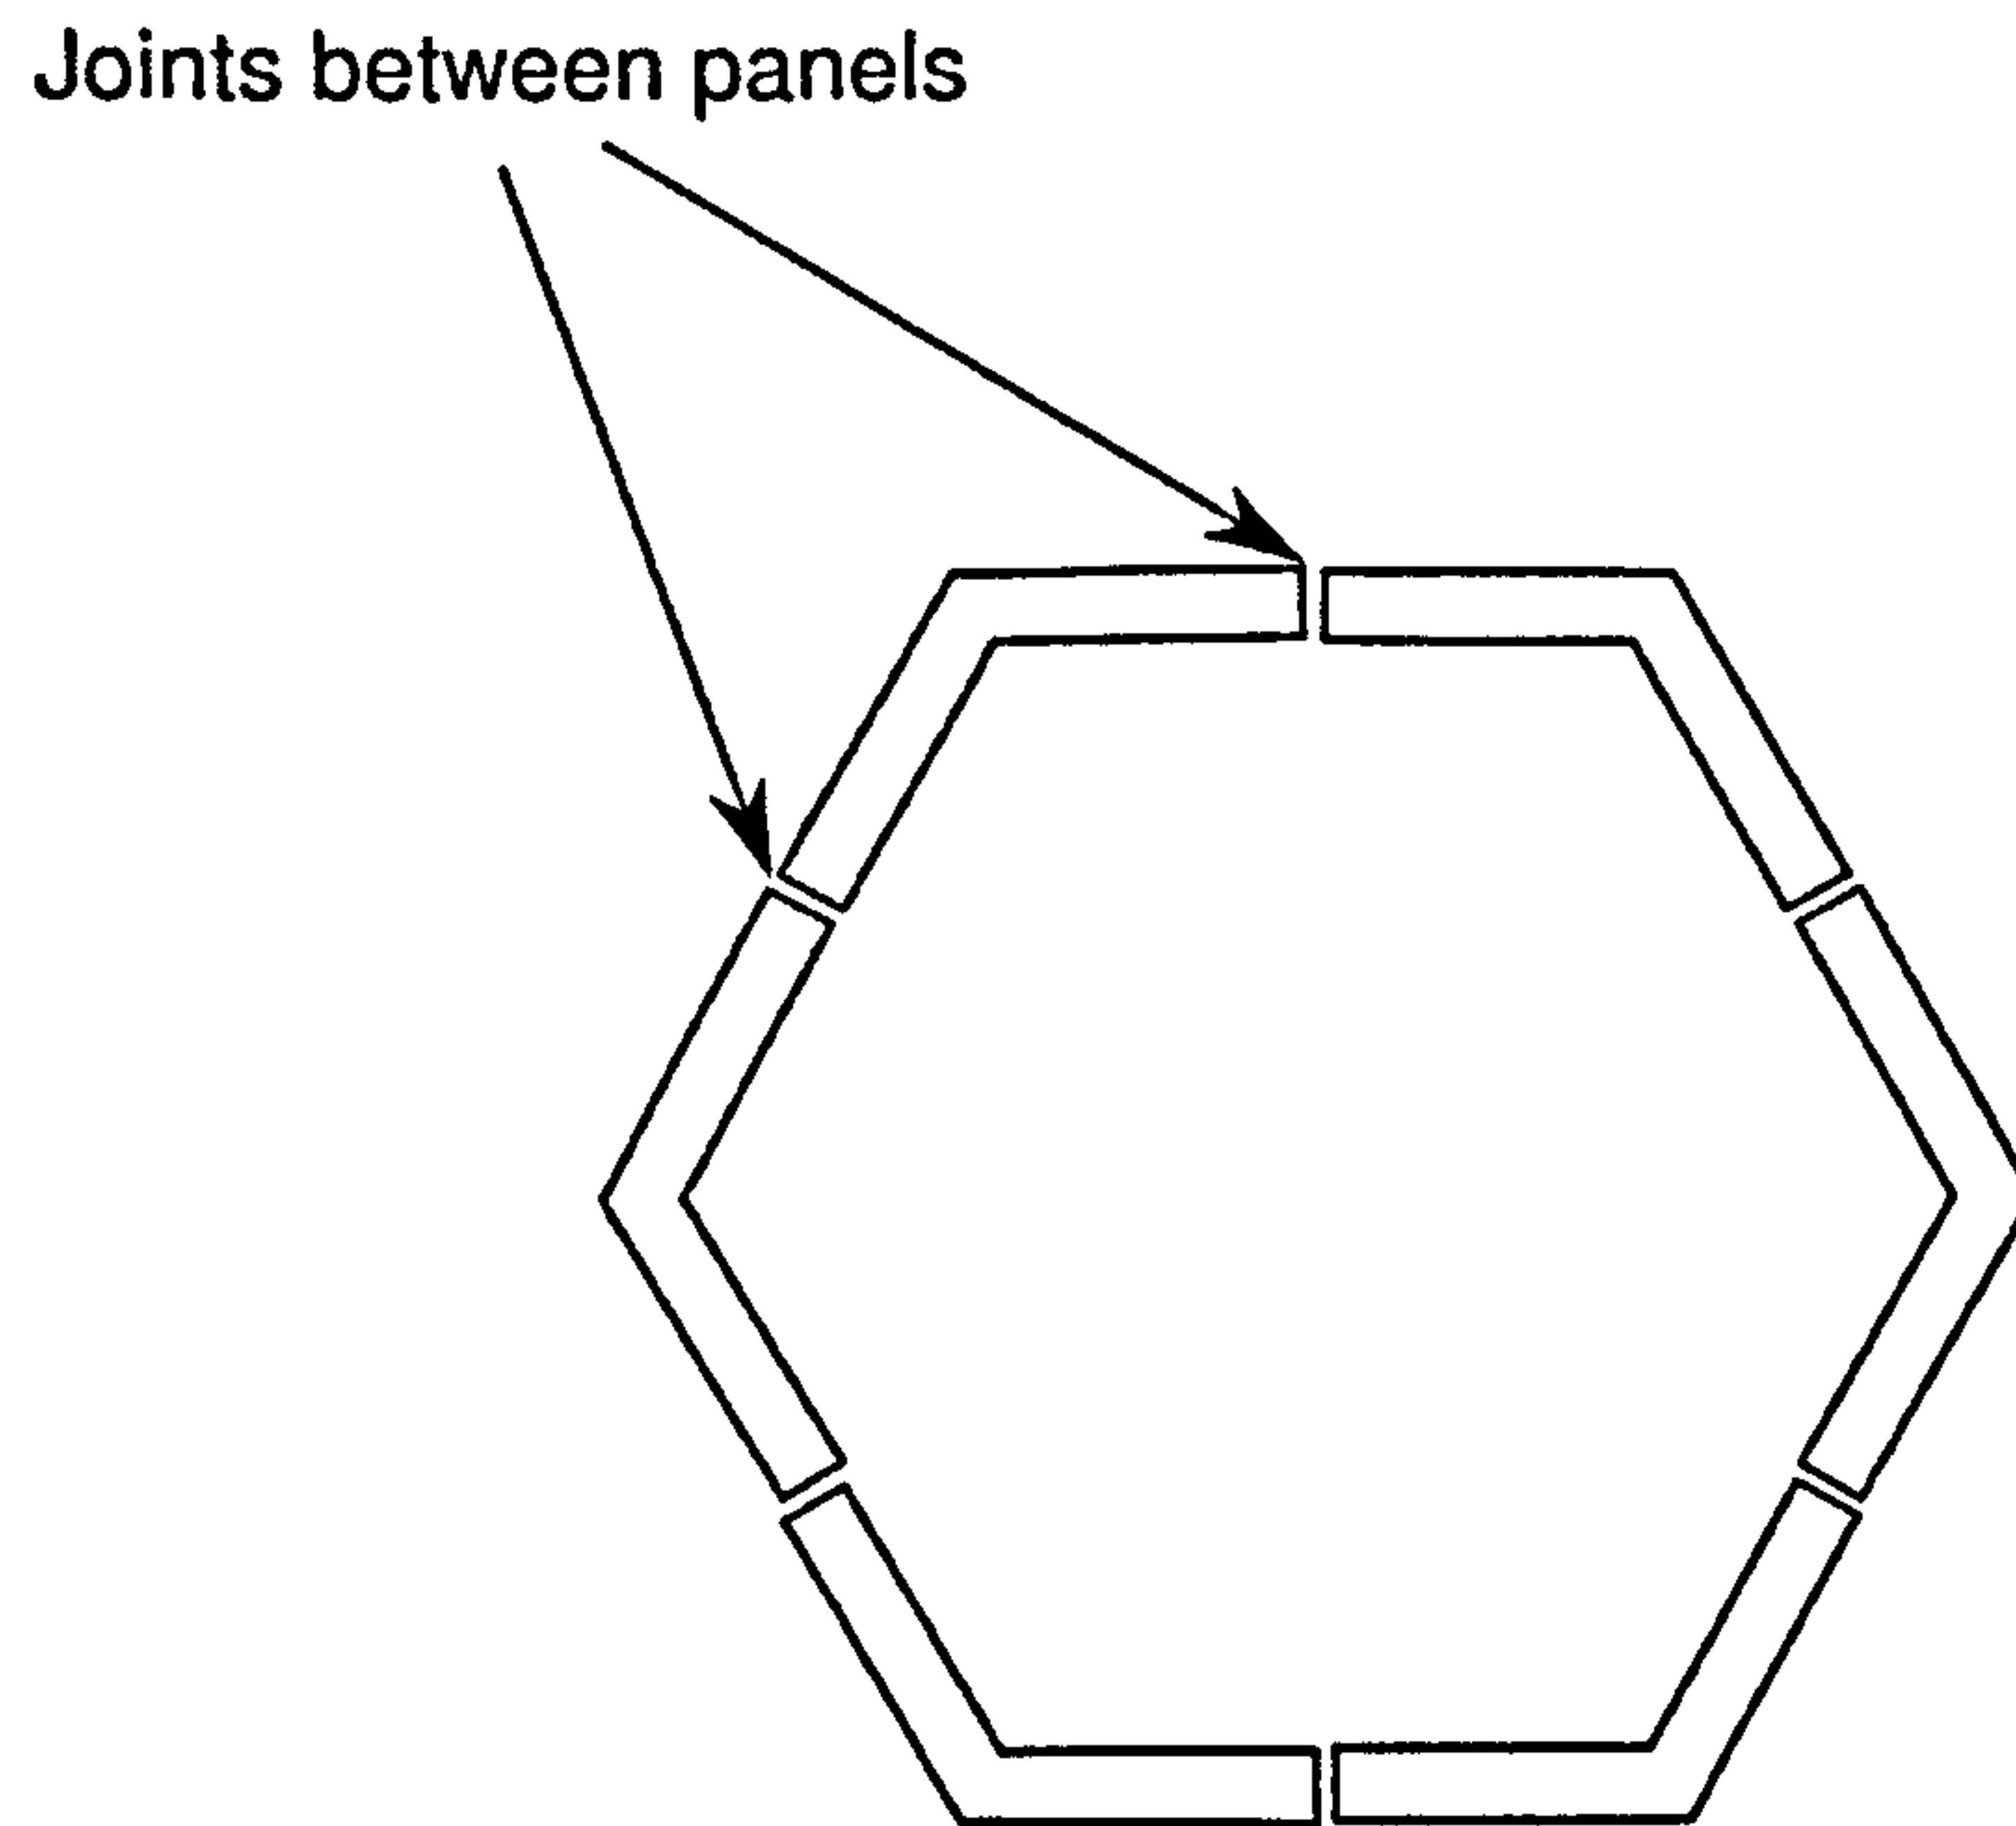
Plan view of hexagonal prismatic tank, showing alternative location for joints
